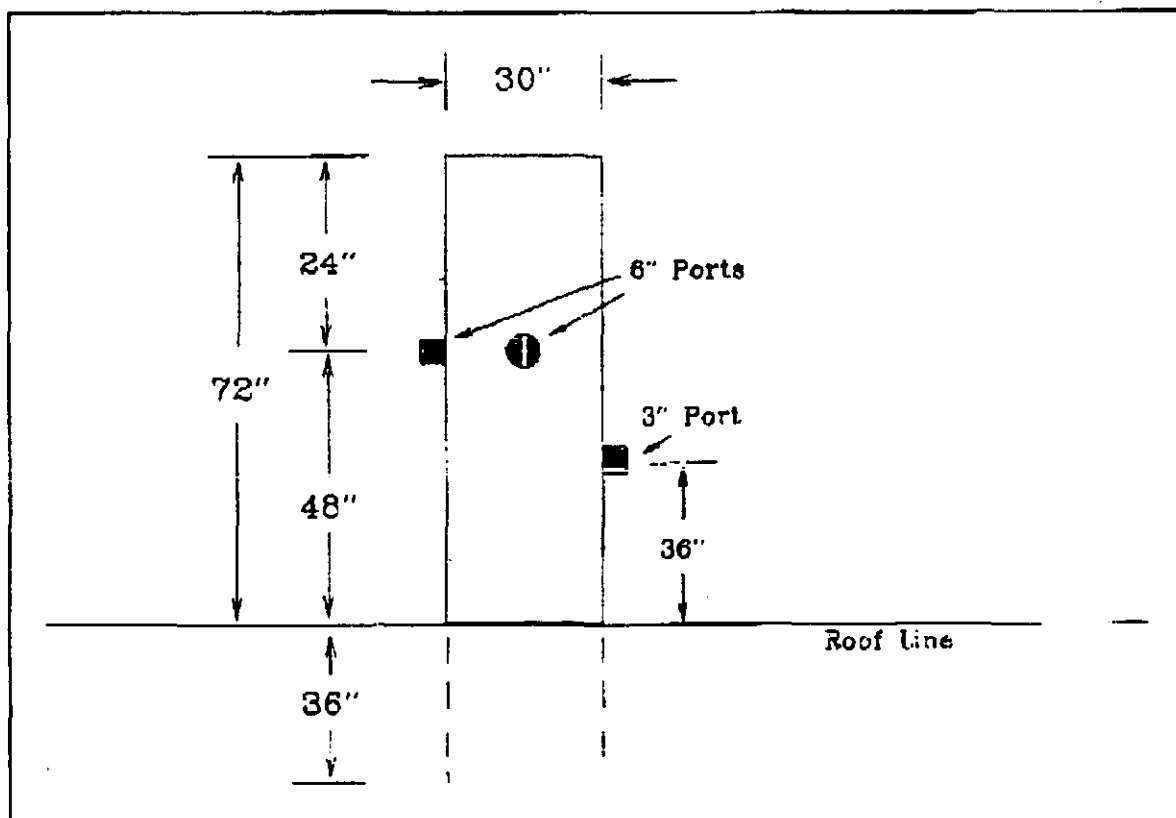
Schematic of Kiln A Dryer Exhaust Stack.
